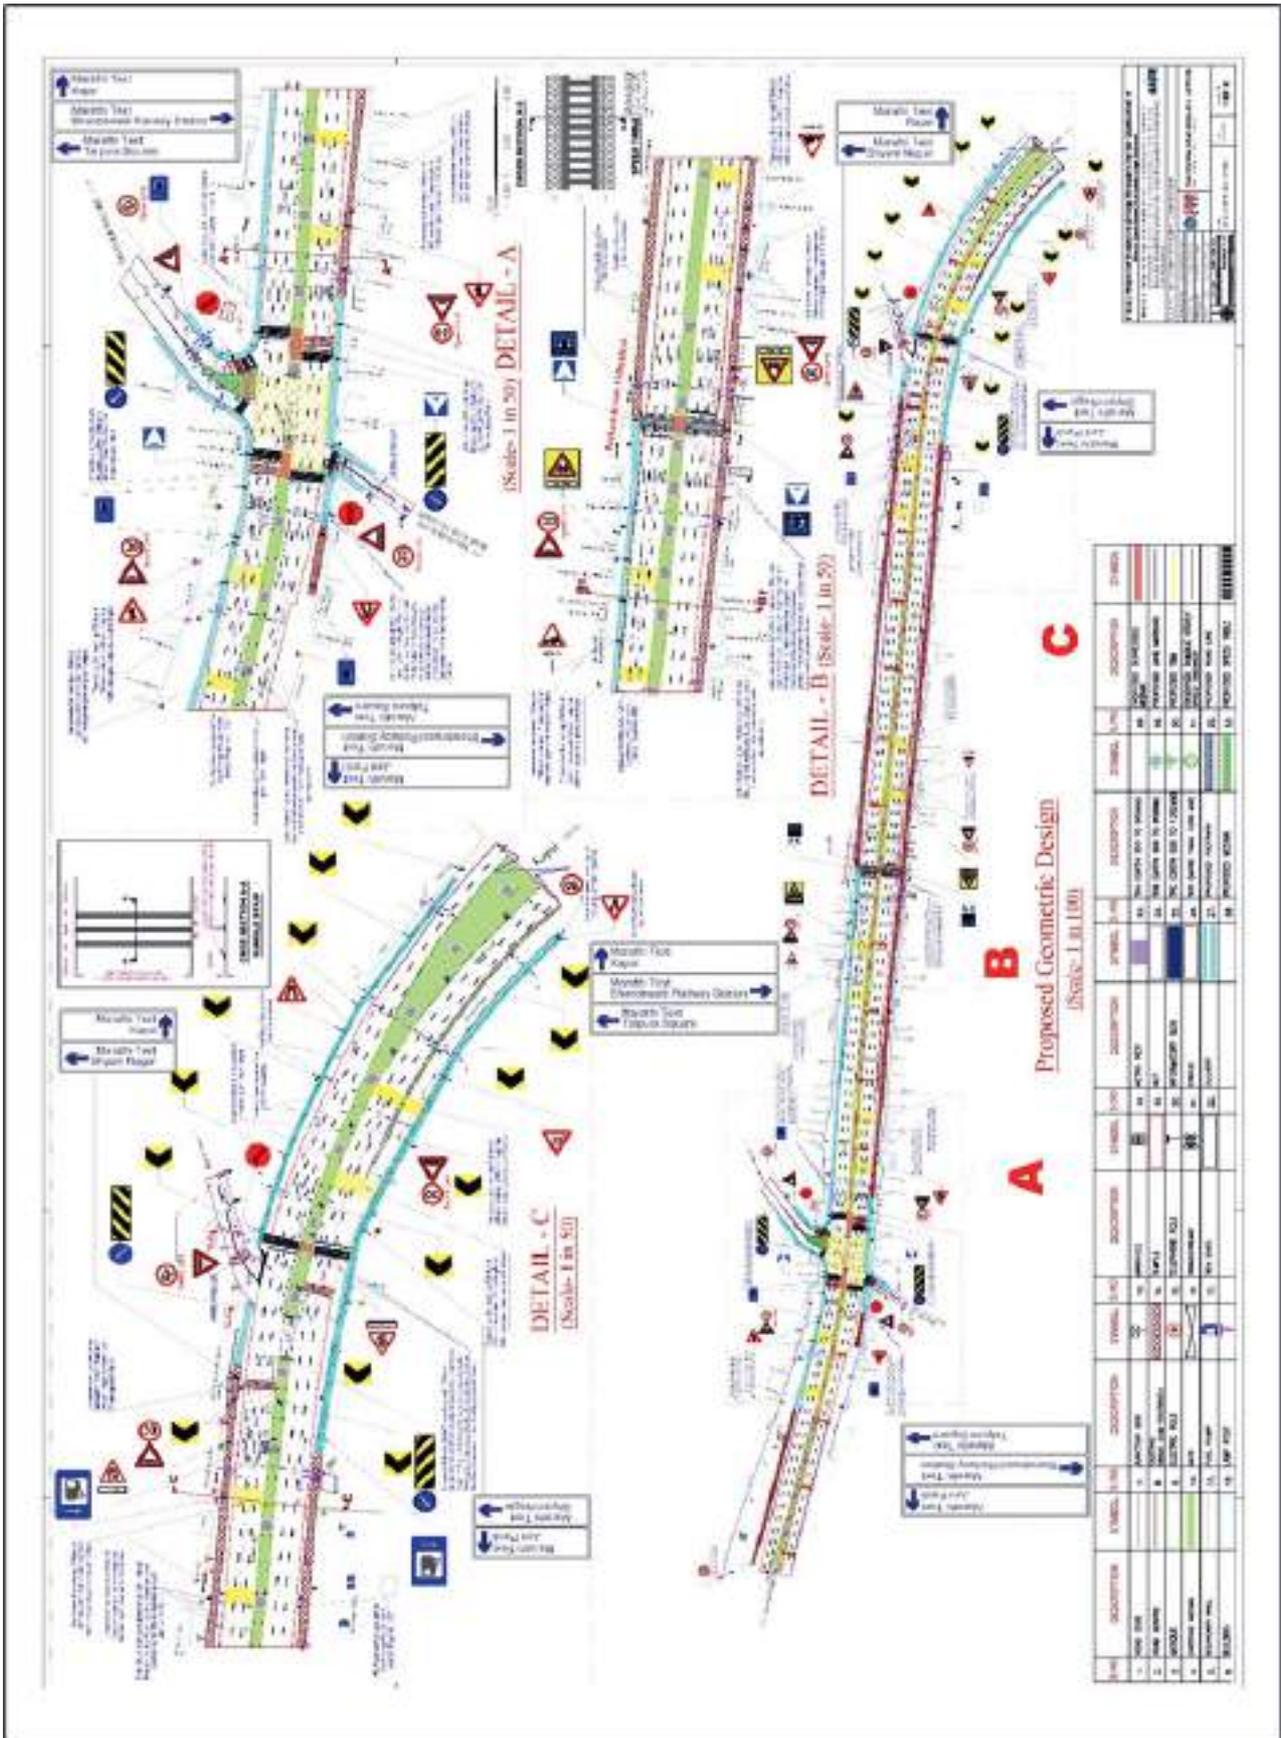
Detailed Geometric Design Plan (GDP) & Traffic Management Plan for Prakash High School Road stretch.
